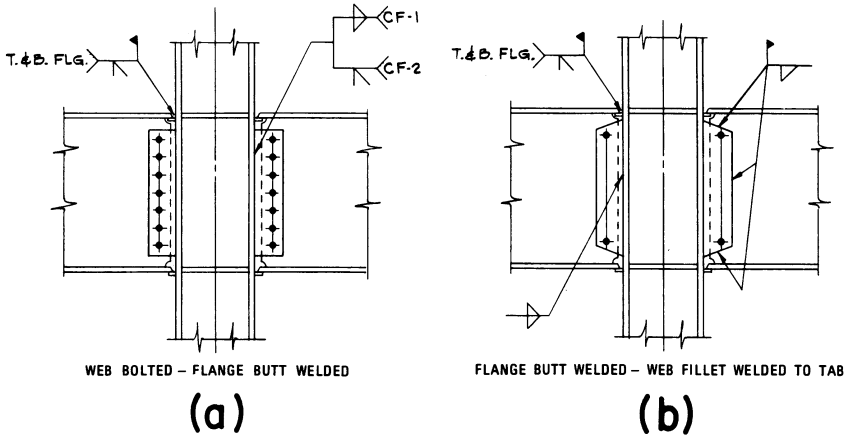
Beam-to-column flange moment connections. (a) web bolted-flange butt welded; (b) flanges and webs welded (Courtesy: Steel Committee of California.)
